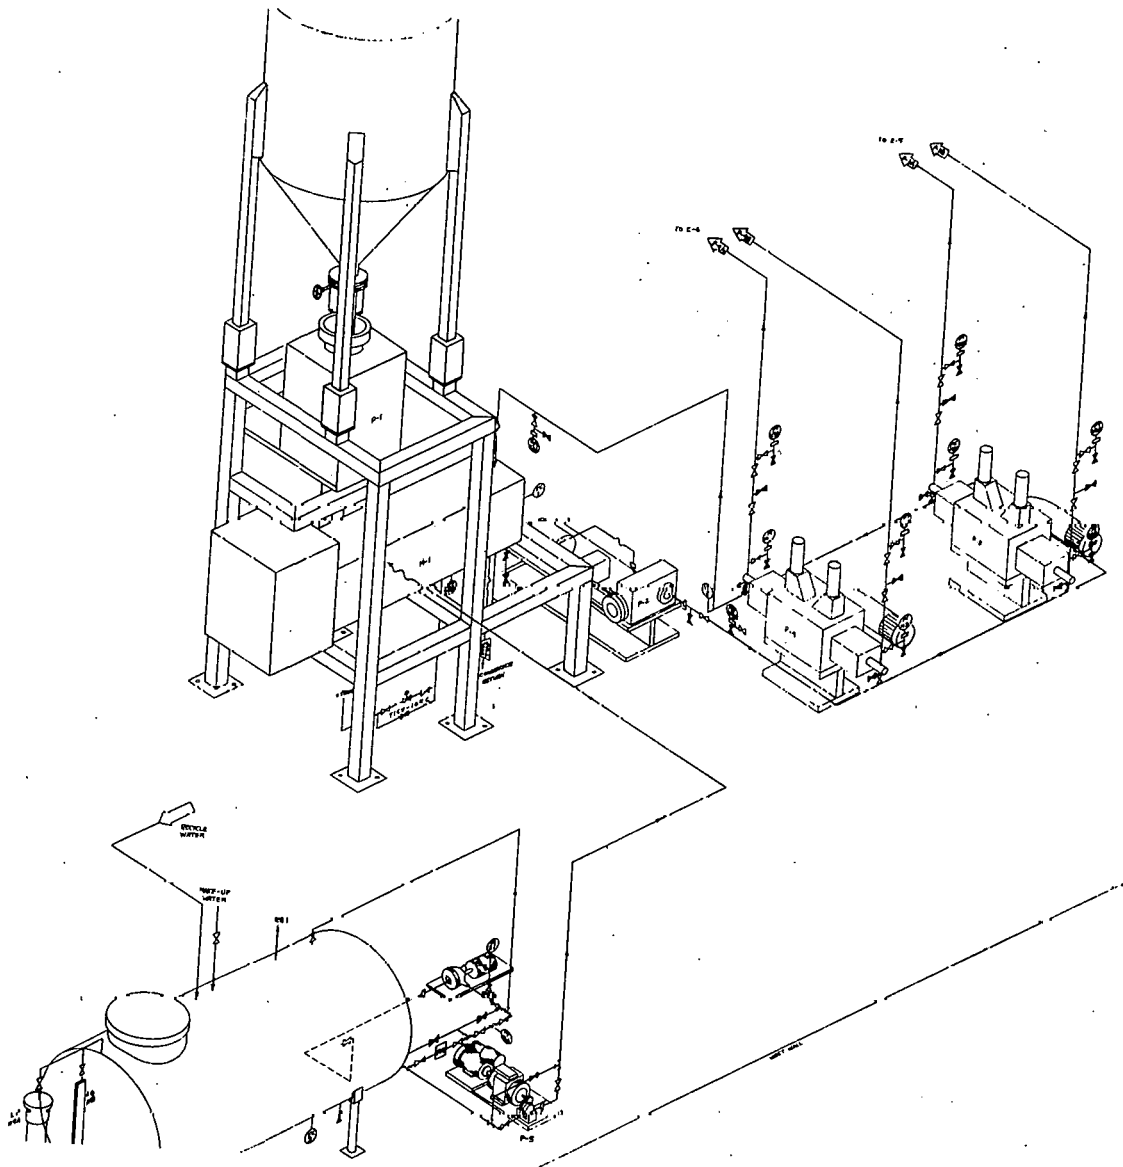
Isometric drawing of the coal feeder support stand and ancillary equipment.
